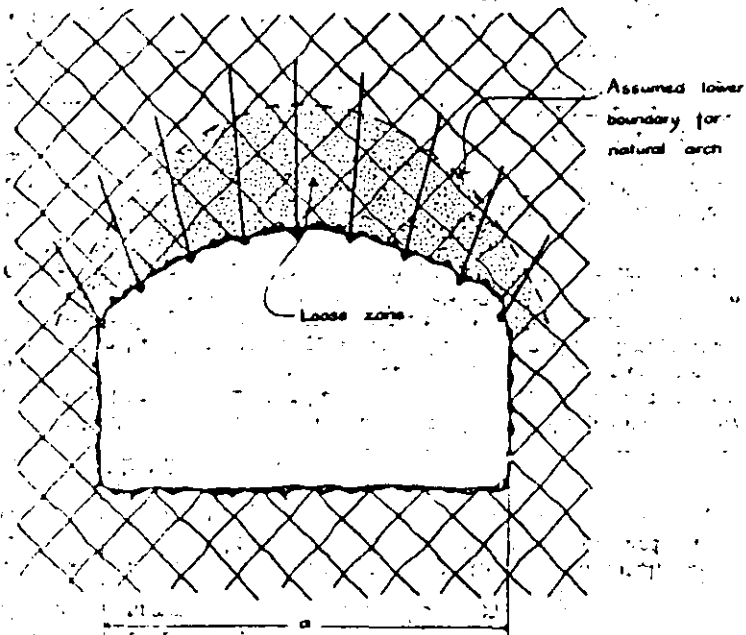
The natural arch concept, which develops above the curved roof of an underground excavation in a moderately jointed rock. The "loose zone" of rock below the natural arch has been reinforced by untensioned rockbolts anchored in the natural arch.
